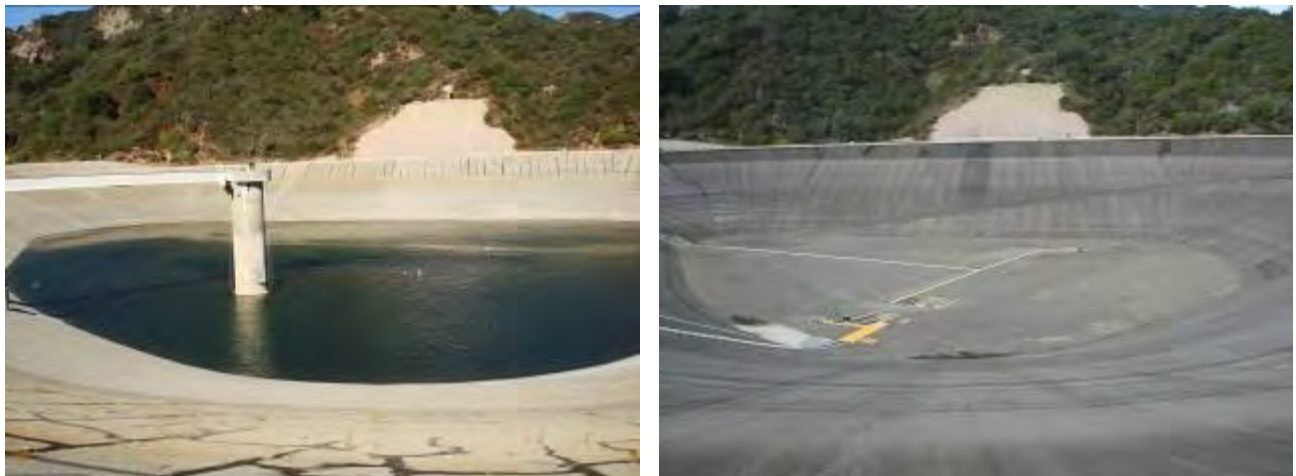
and 5: Original reservoir (left) and after removal of tower and new asphalt concrete lining (right). Note the original concrete faced slope at back.
